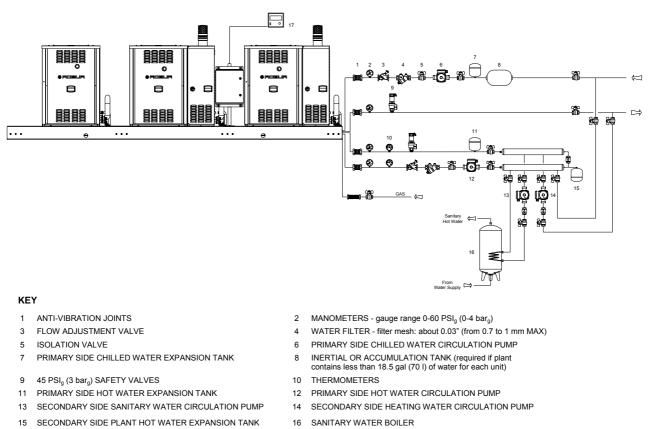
Typical piping arrangement for a RTYF/2 HT.
